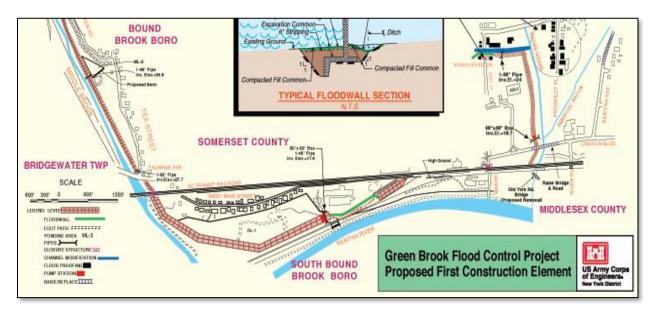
Green Brook Flood Control Project – Proposed First Construction Element https://www.nan.usace.army.mil/portals/37/siteimages/021712-D-CR197-136.jpg
